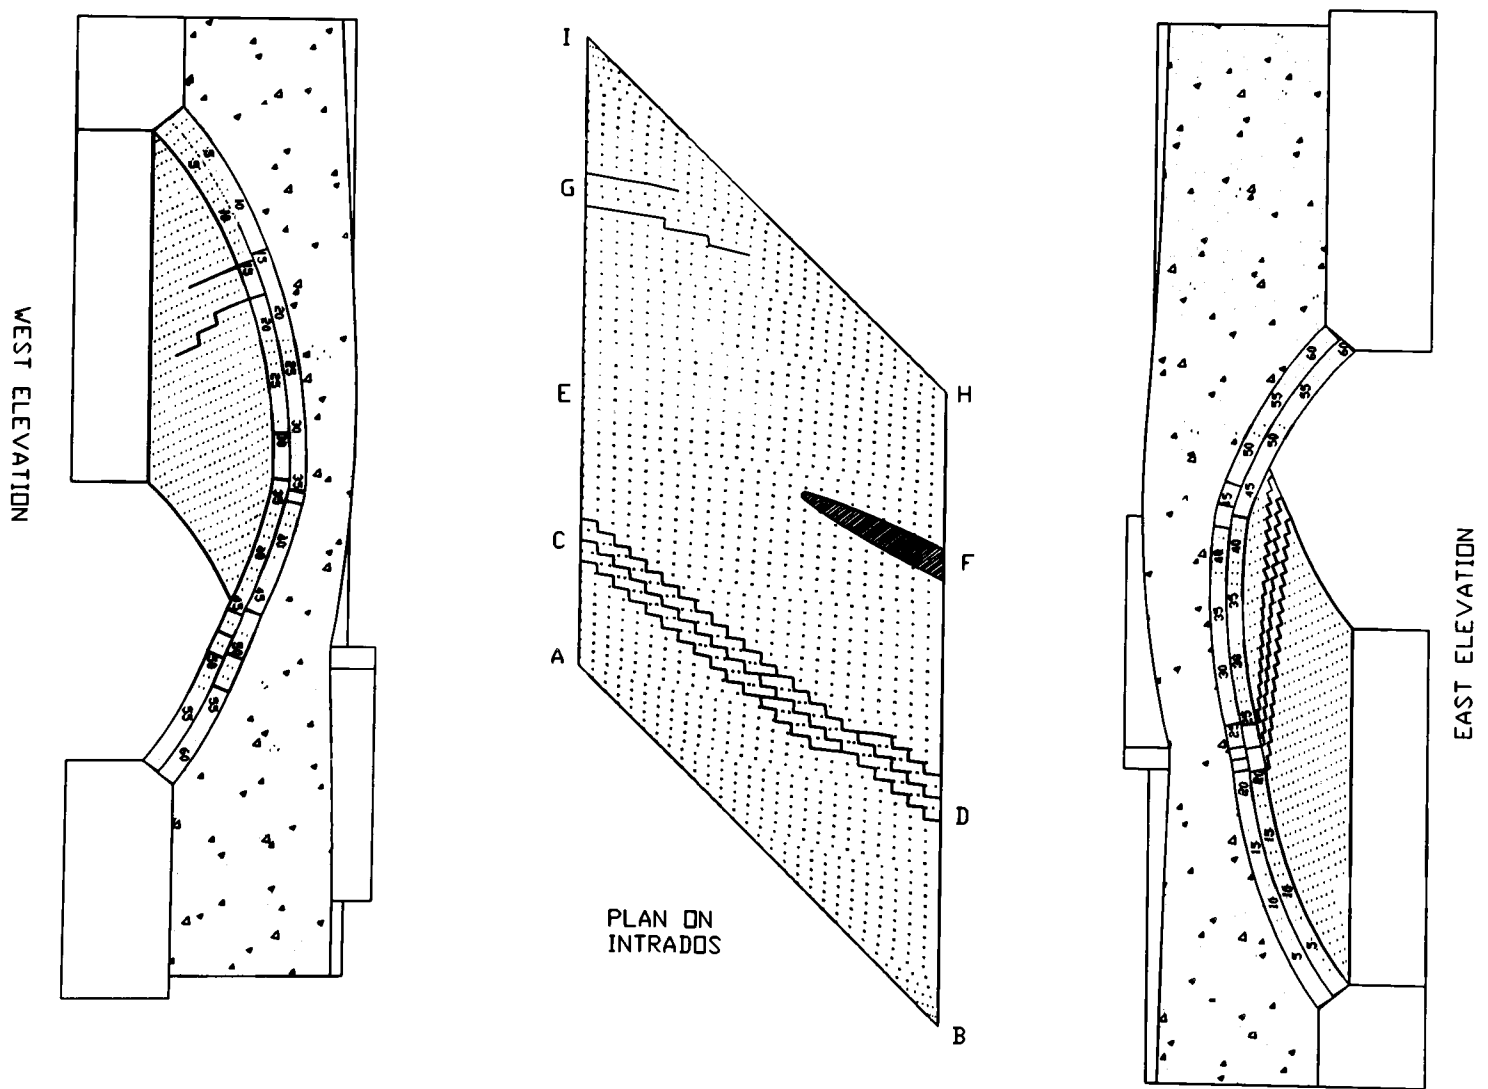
Collapse Mechanism of skewed arch bridge 3-4
